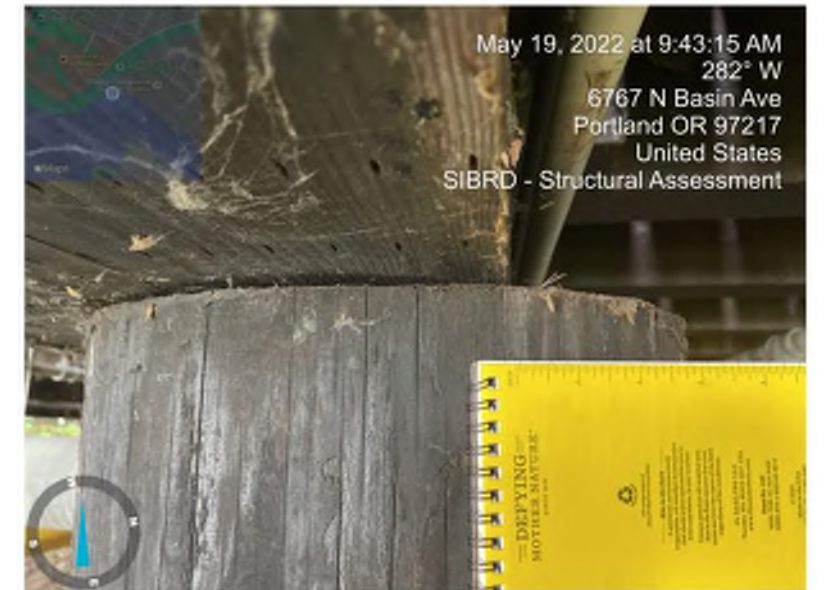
U.S. Coast Guard Dock and Pier Substructure
